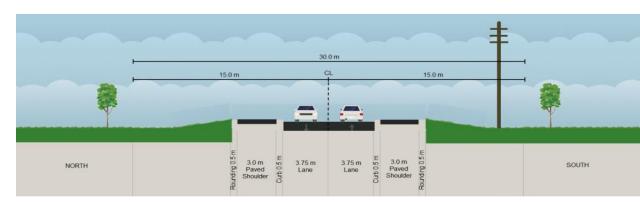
Sub-Section 2-5 – Modified Cross Section
